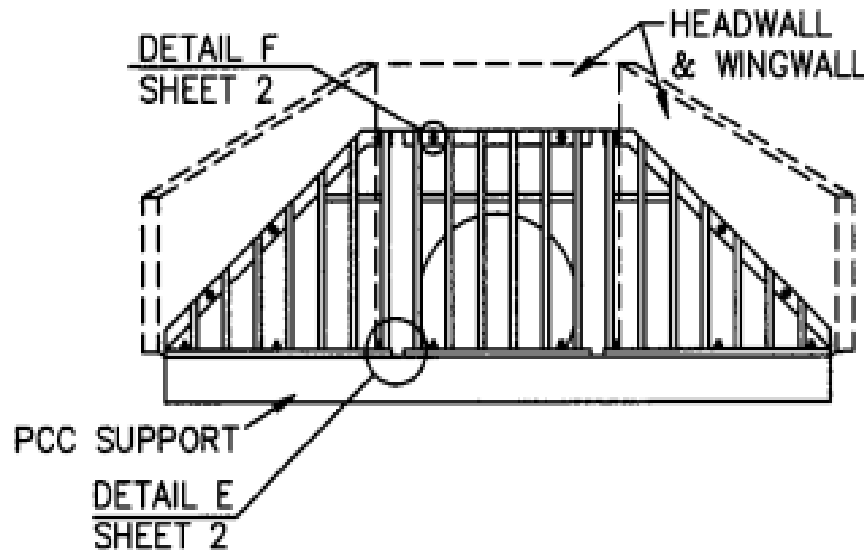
Trash Rack (Inclined) Standard Plan 361-2 (Public Works Standards, Inc., 2009)
